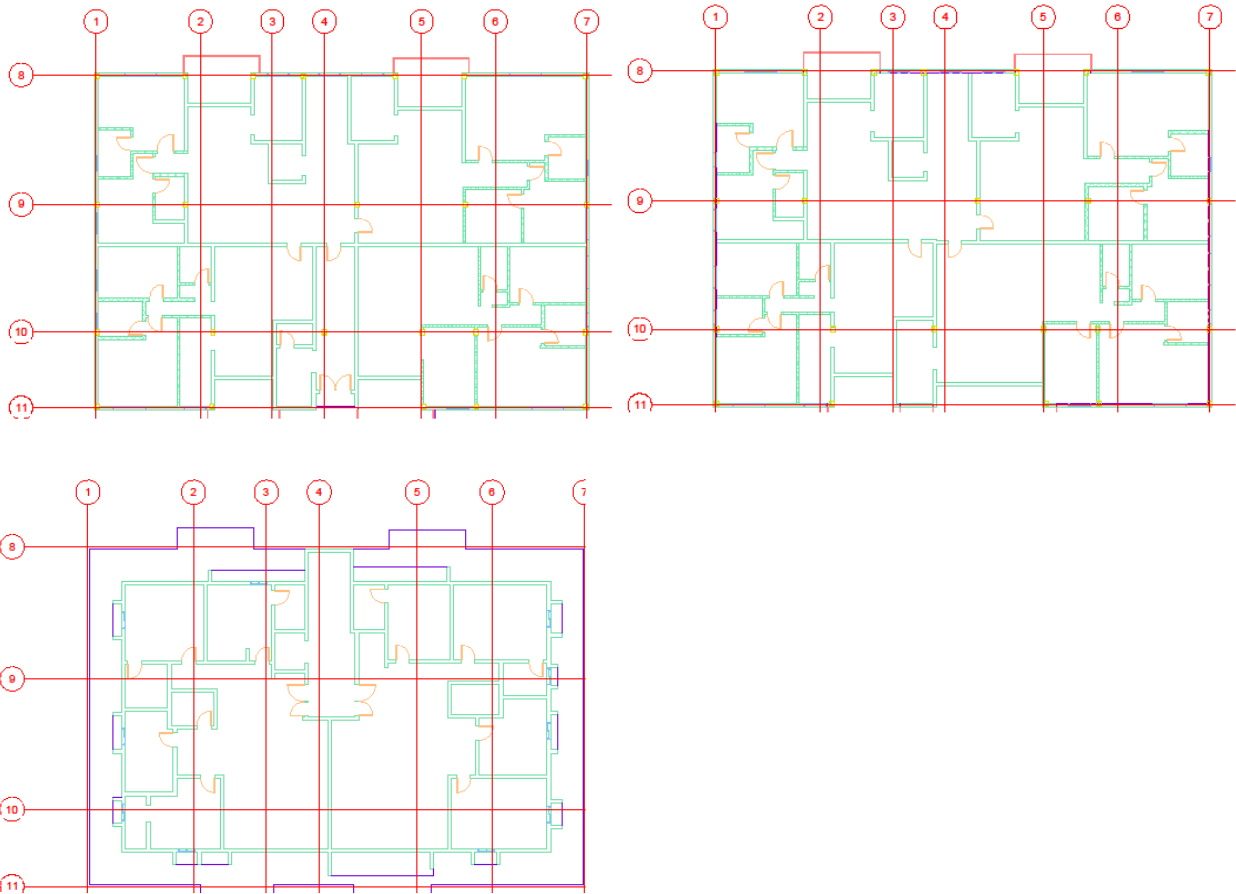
Varnero apartment floor plan: ground, first to fourth typical and fifth floor (top to bottom)
